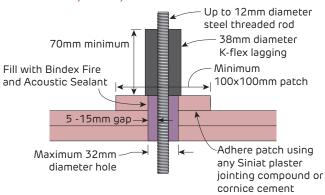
Up to 12mm steel diameter threaded rod Maintains RISF and FRL of Universal Ceiling Systems Patch above ceiling lining Valid for 2 layers only - Section
